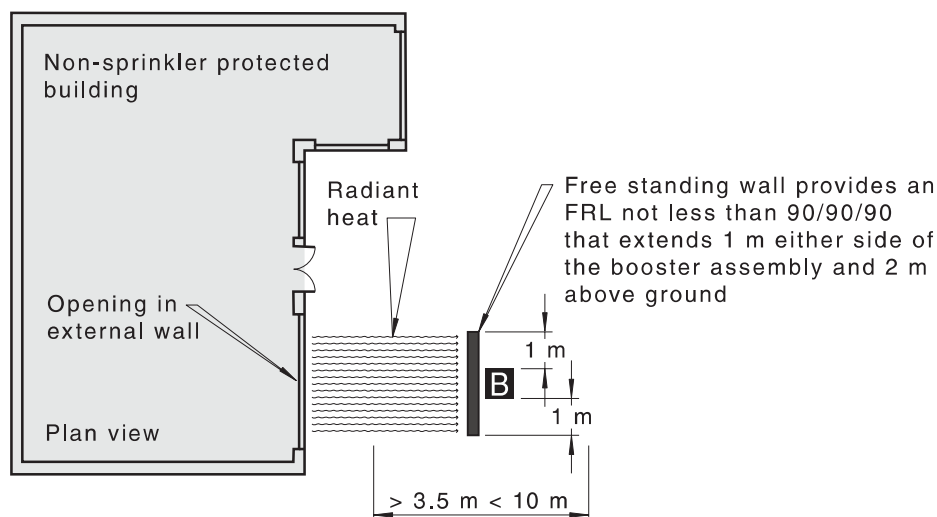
(C) — Fire brigade booster assembly provided protection by a freestanding wall located more than 3.5 m and less than 10 m from the building
